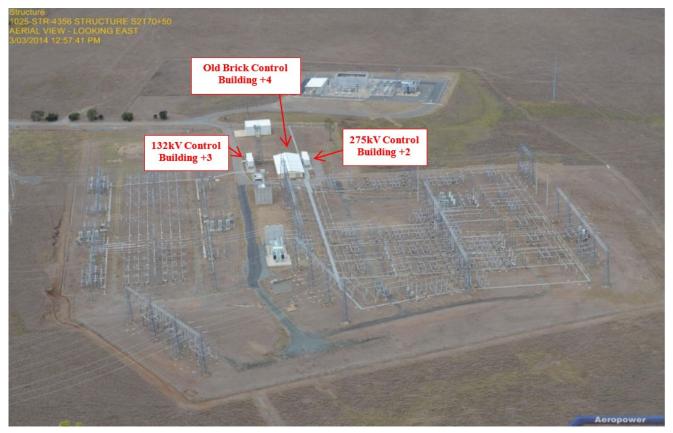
132kV/275kV Woolooga Substation control room arrangement
